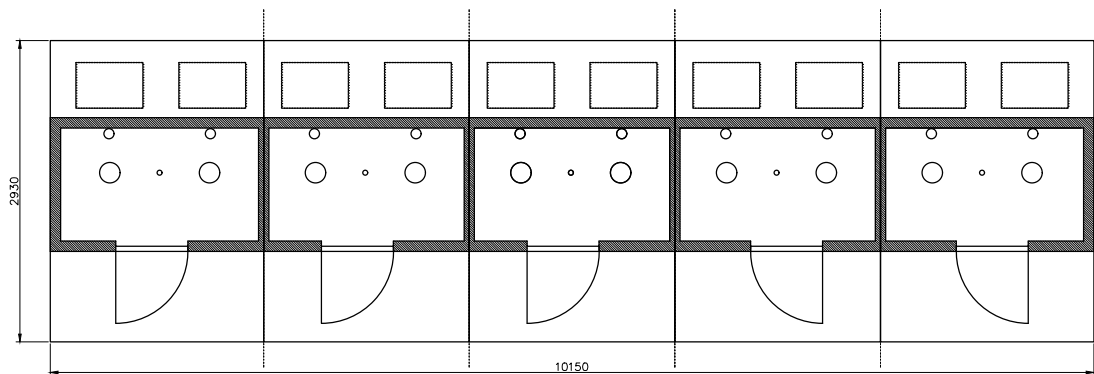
Overview of stalls in one toilet block. Each stall has two defecation holes, one urine hole, two ventilation pipes and two metal hatches that can be seen at the top of the drawing.
